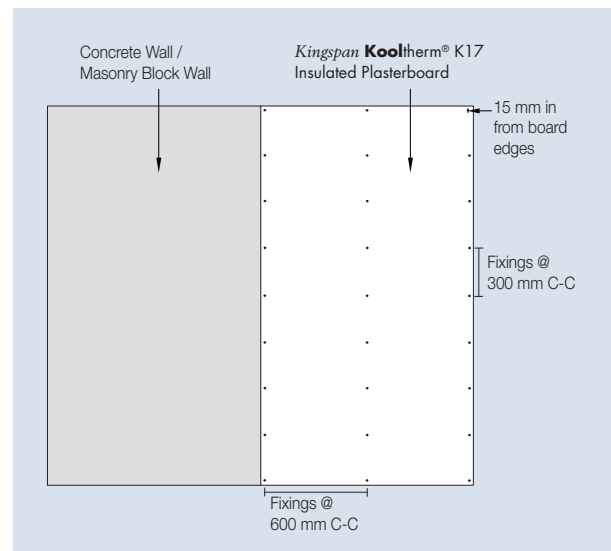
Kingspan Kooltherm® K17 Insulated Plasterboard Installation Details for mechanical fixing
